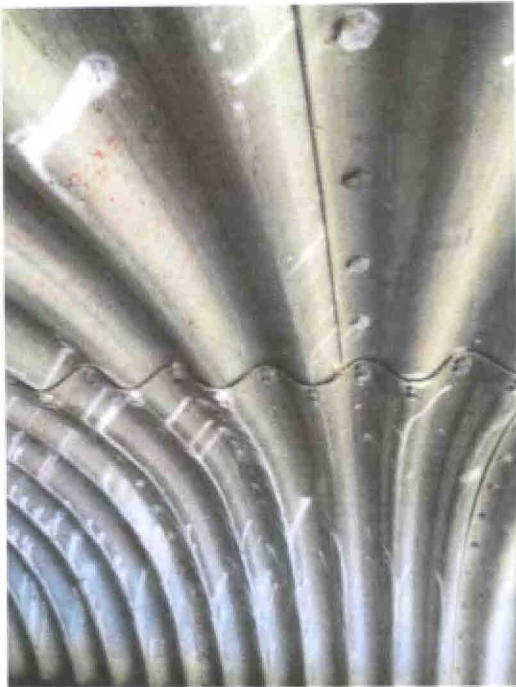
East Span, typical splice of corrugated arch plates. Note: evidence of oxidation from water seepage of supported fill above (typical).
